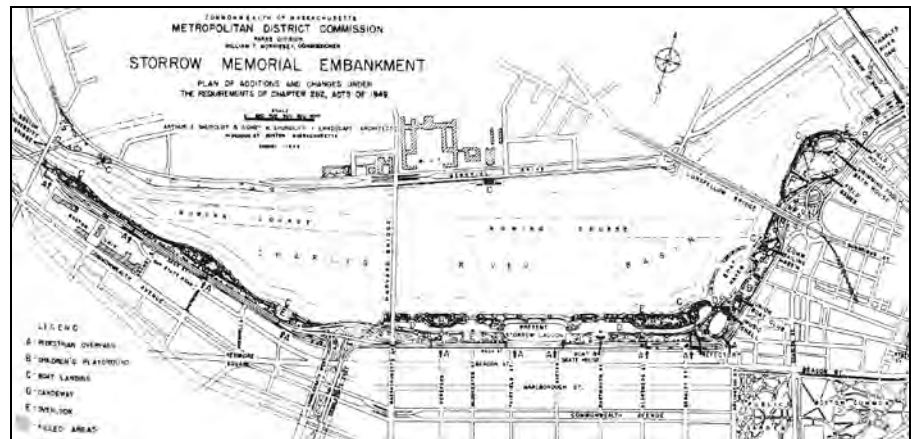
Shurcliff’s 1949 plan. (DCR archives)
